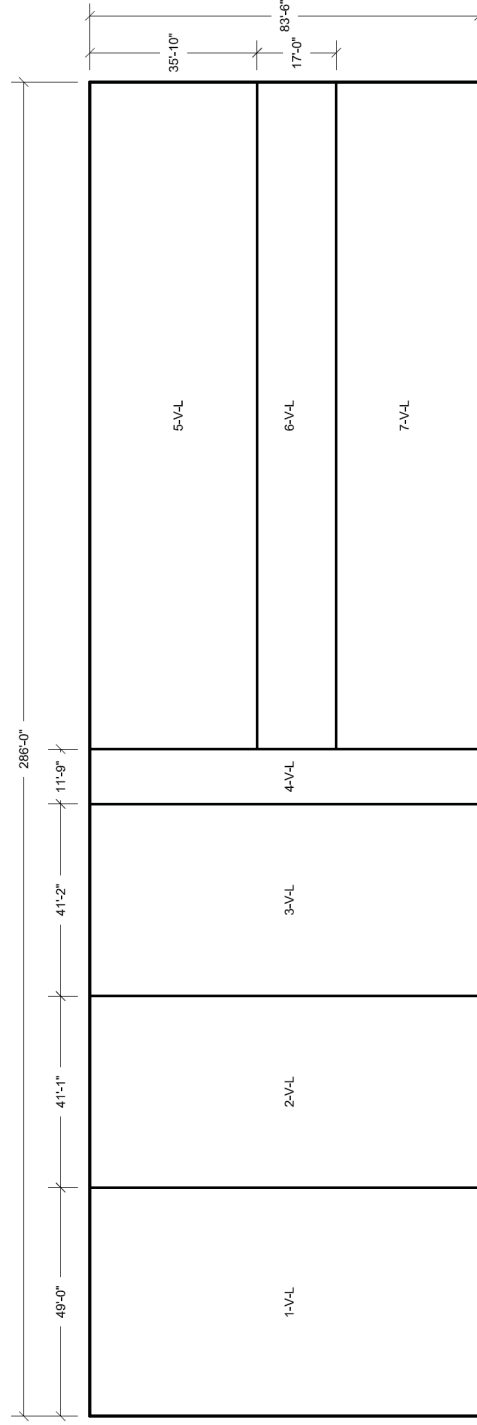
H-6-83: UHS BASIN NORTH WALL LOOKING SOUTH
